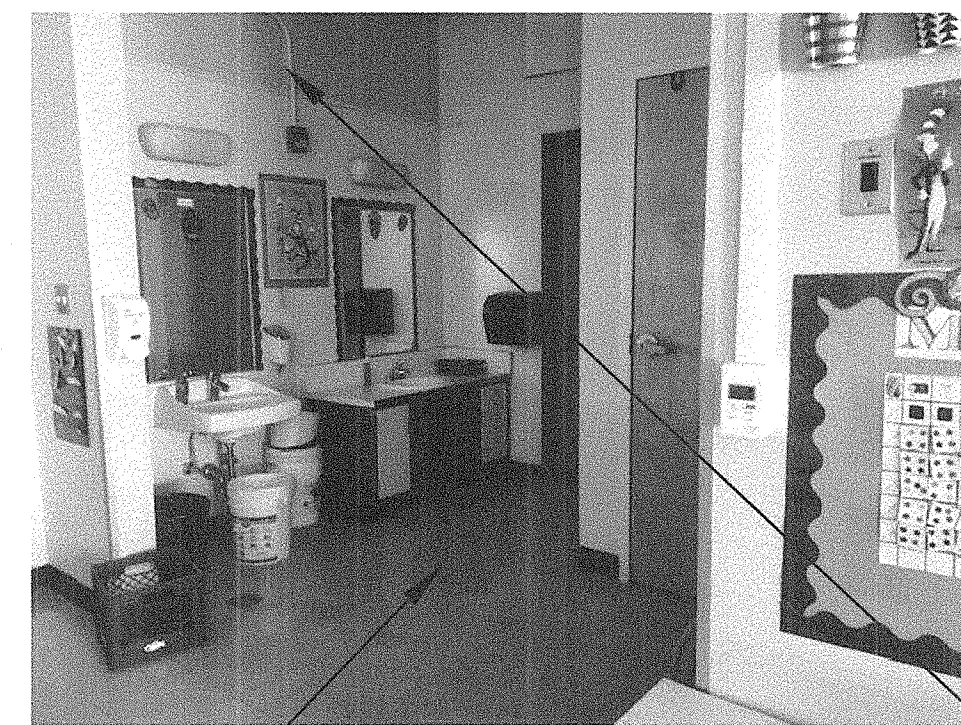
PHOTO A - EXISTING CONDITION SIM. AT CLASS RM 2
